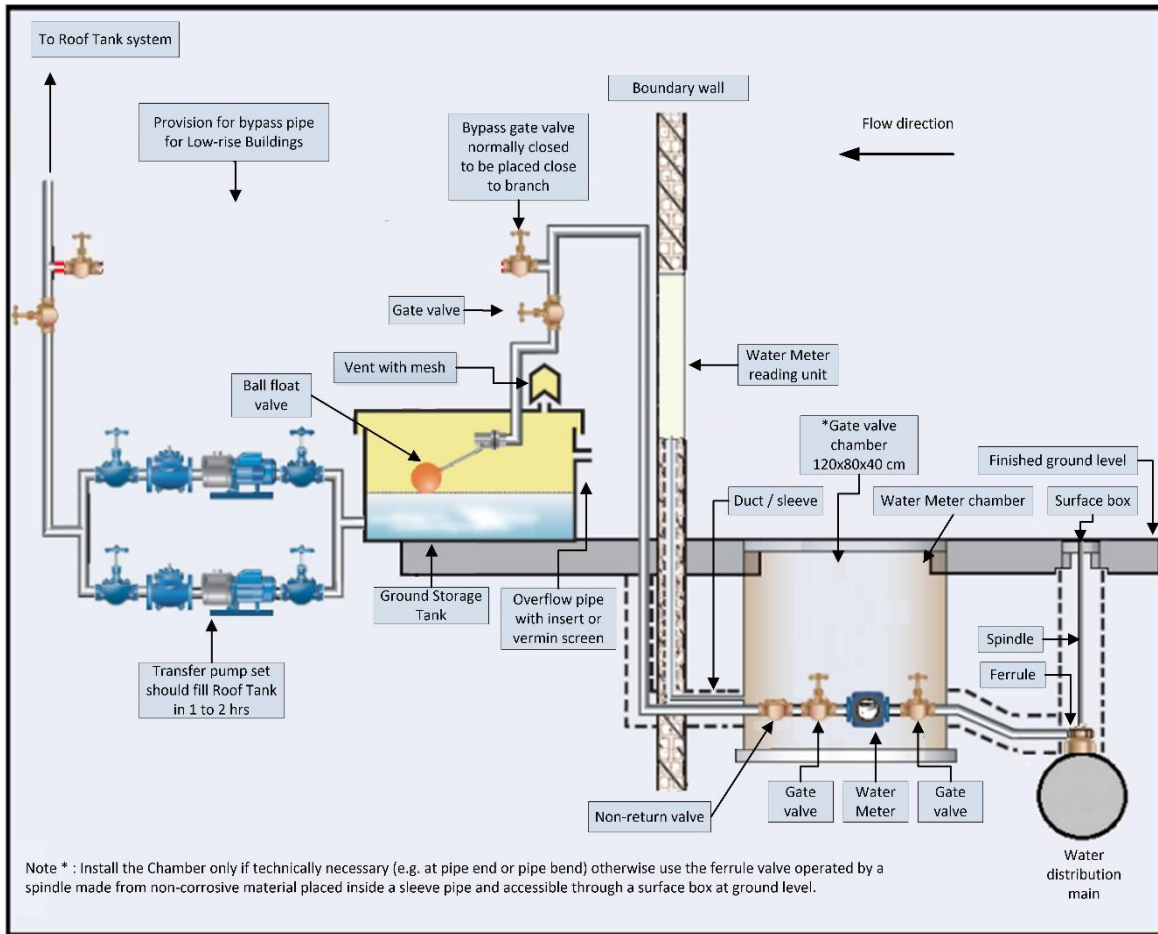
A Typical Service Connection arrangement a main distribution pipe to a Customer Low-rise Premise with Ground Storage Tank and bypass
